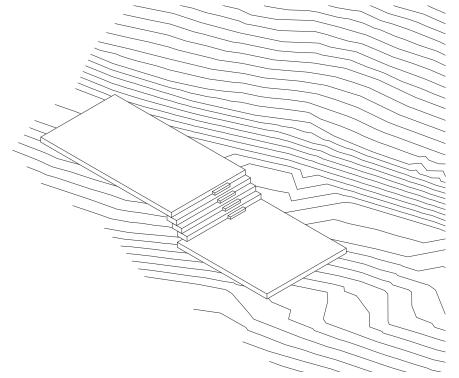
House floor plate to demonstrate steps as nucleus of house, seating area and transition point - Author's own
